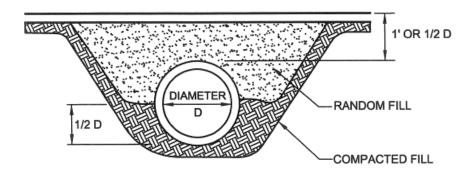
Standard Construction Detail for Ditch Relief Culverts
